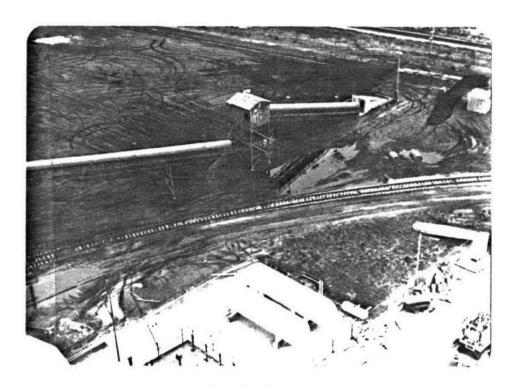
View from the boiler house roof facing southeast showing the crusher house and part of the coal storage area.
